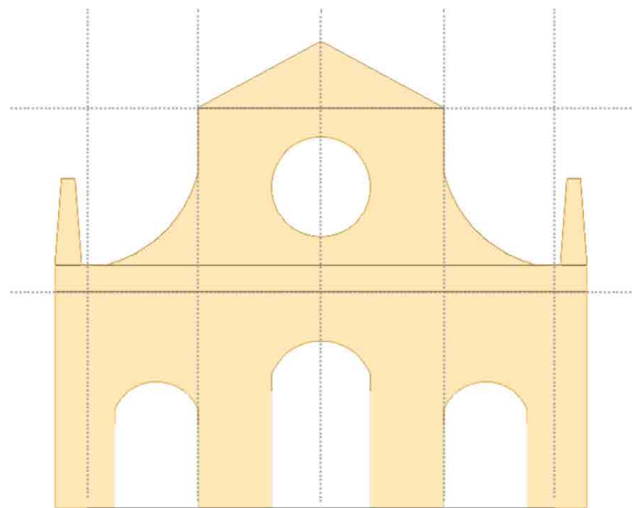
Example of a DXF file of a wall with irregularly curved elements, defined in the OPEN mode in the vertical plane with elevation lines.
